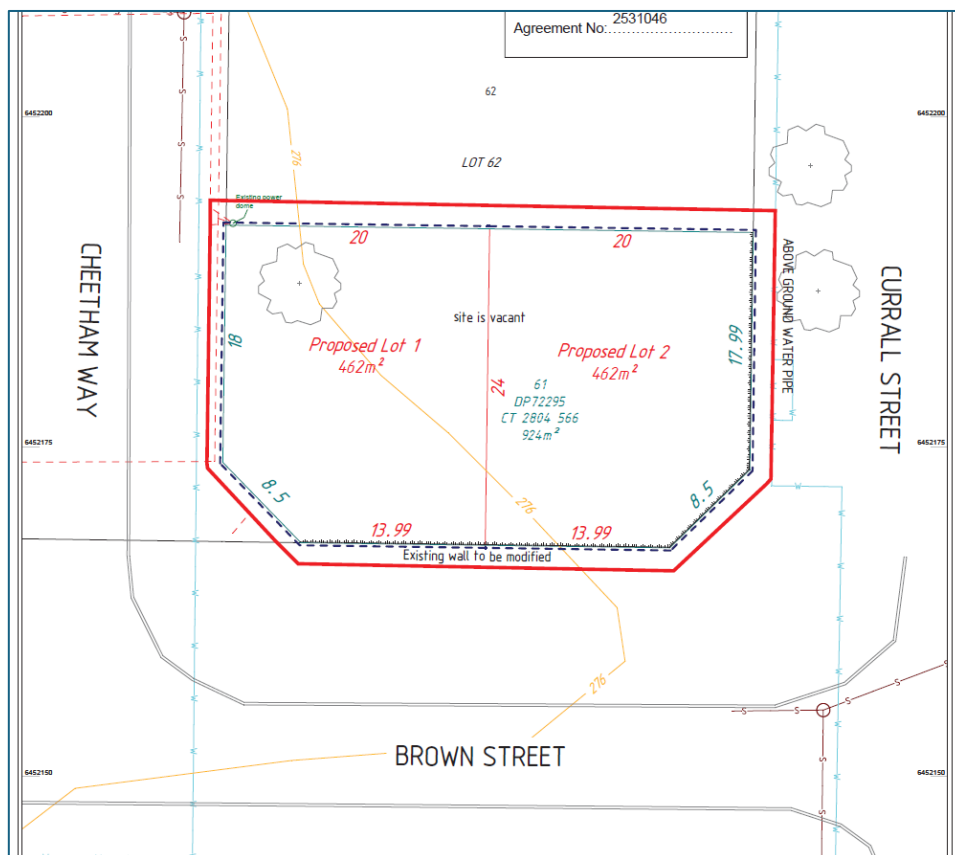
Site location for proposed buildings – 49 Cheetham Way (Lot 2 Brown Street)
